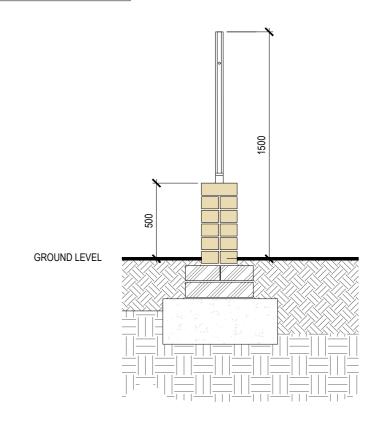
High Railing & Brick Faced Wall Scale 1:25
